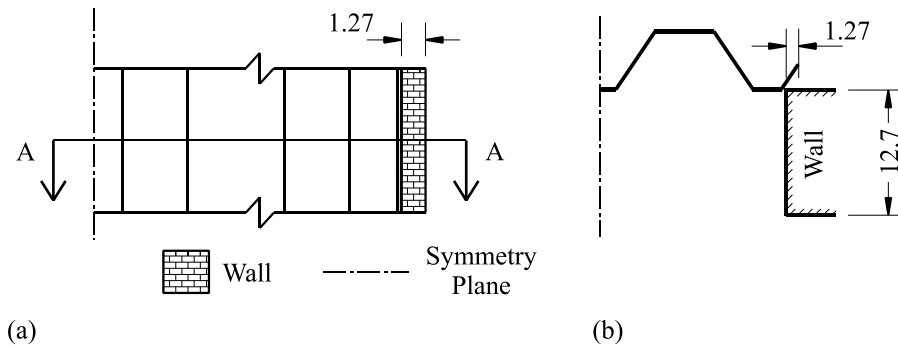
New boundary condition case corresponding to an aluminum storm panel wider than a window opening: (a) elevation, and (b) section
